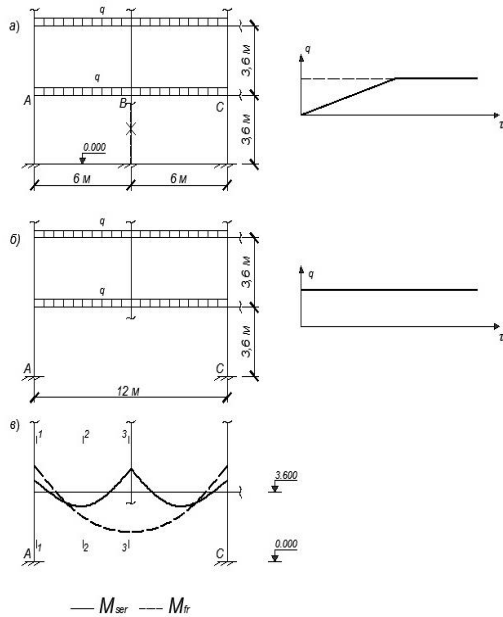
Design scheme of a slab element in case of failure of the internal column of the ground floor
